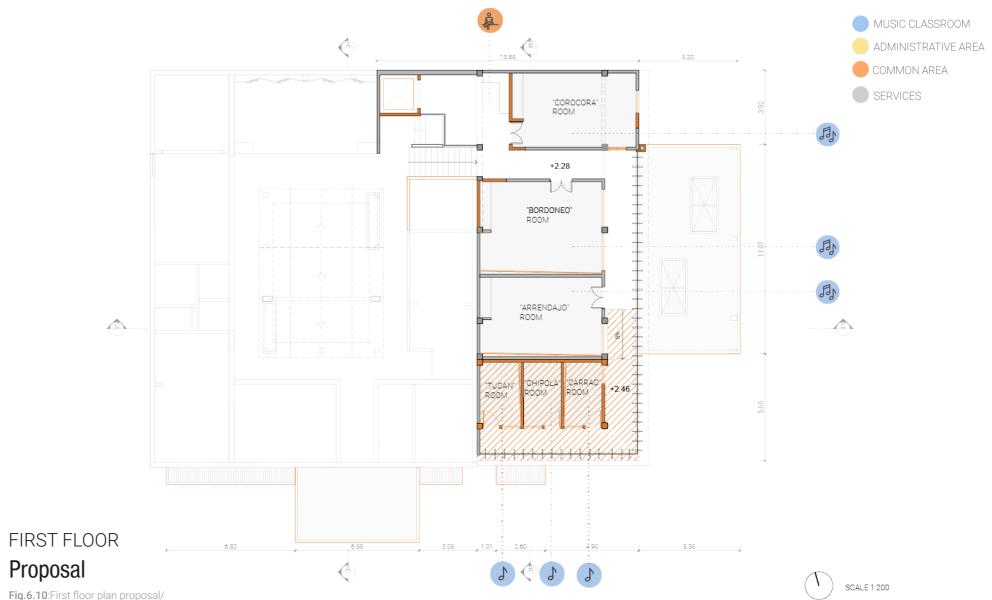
First floor plan proposal/ Source: Author's elaboration
